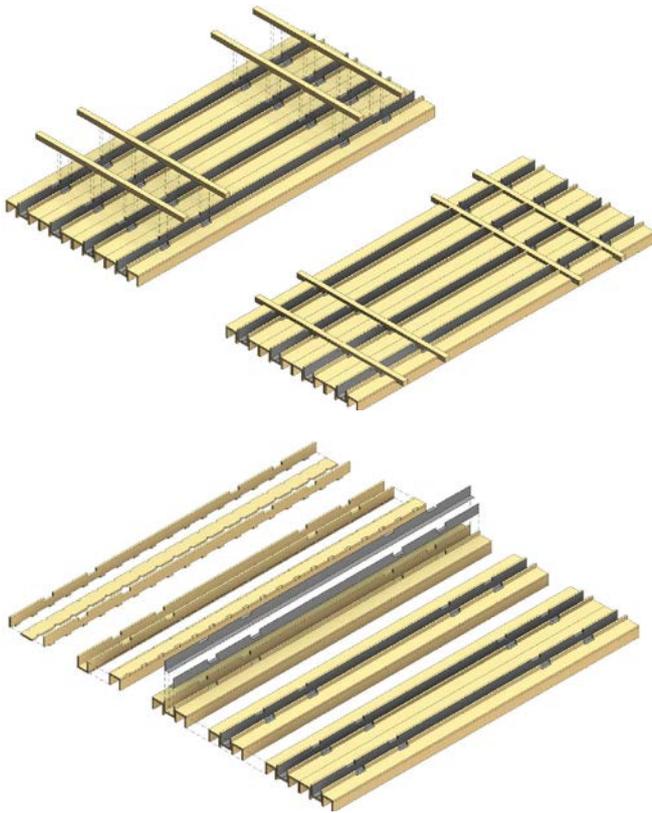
Proposal for prefabricated timber-steel-concrete-ribbed decks
